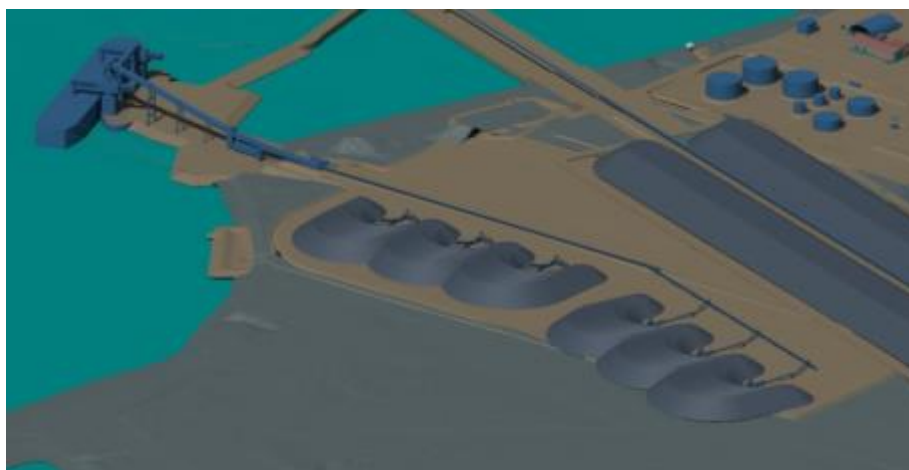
Fines Stockpile and Ship Loading Arrangement
